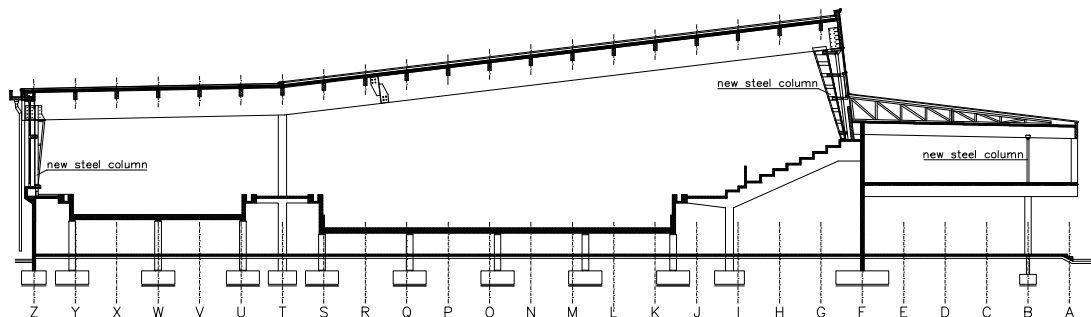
Position of new steel columns as a reinforcement of existing timber structure.
